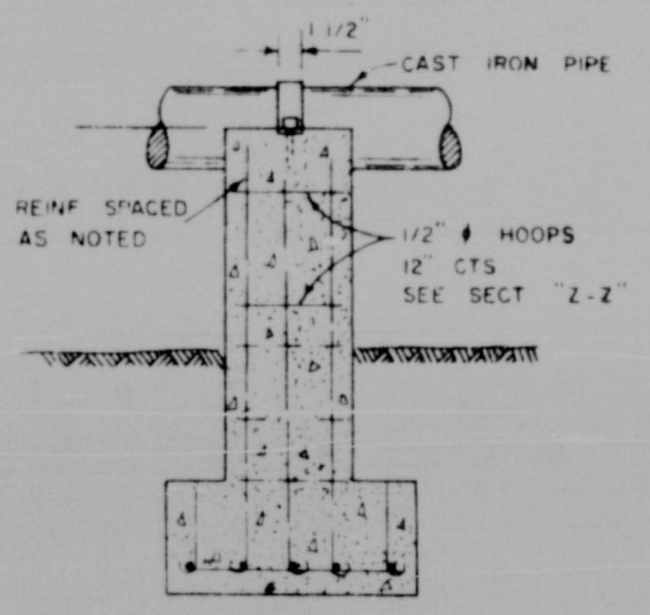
DETAILS OF CONCRETE ANCHOR FOR VERTICAL BENDS
